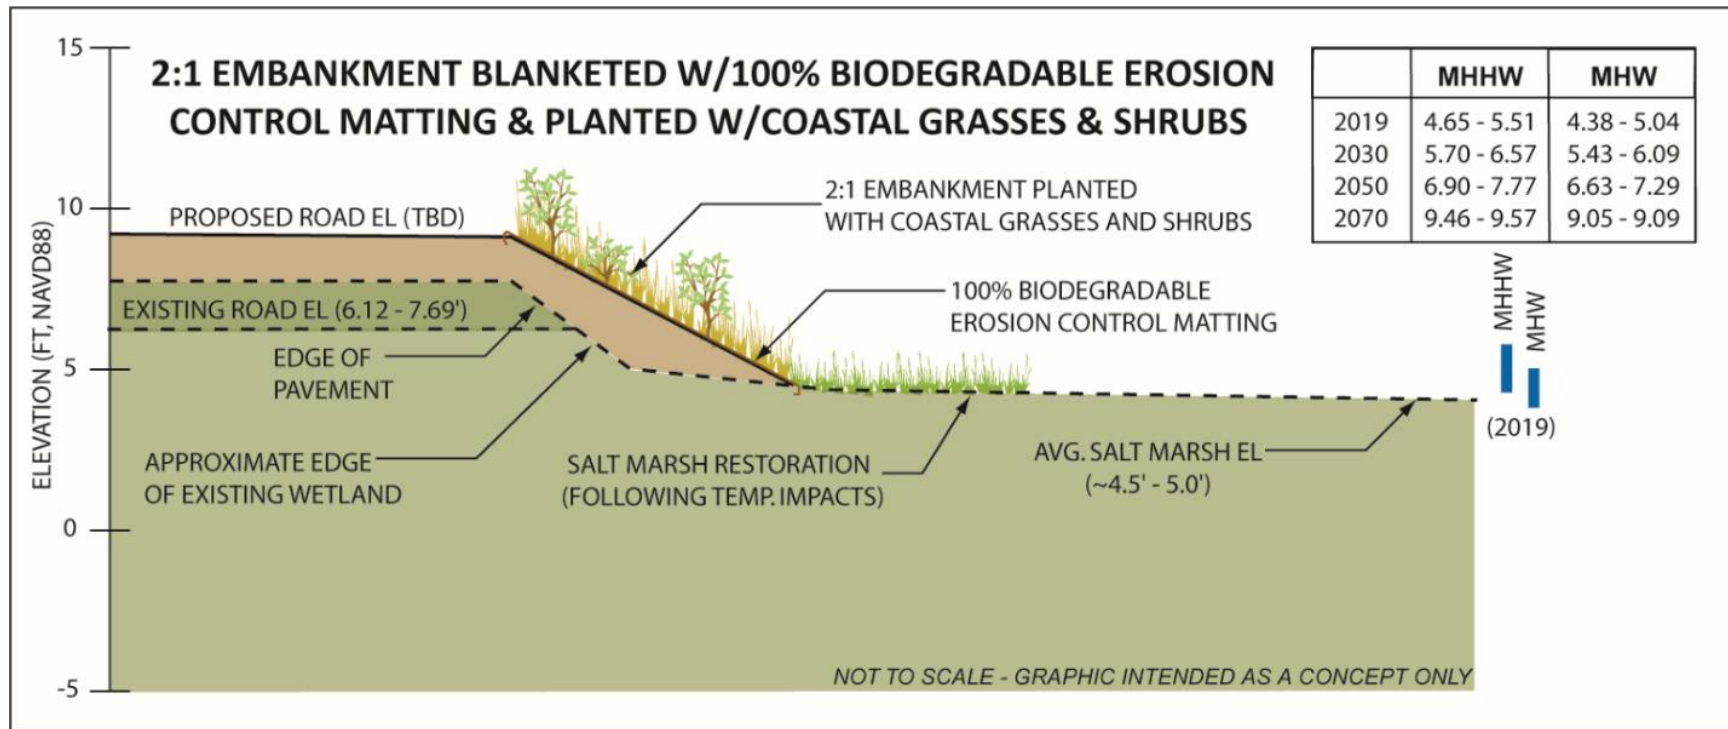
Raised roadway and reconstructed embankment alternative at 2:1 slope.
